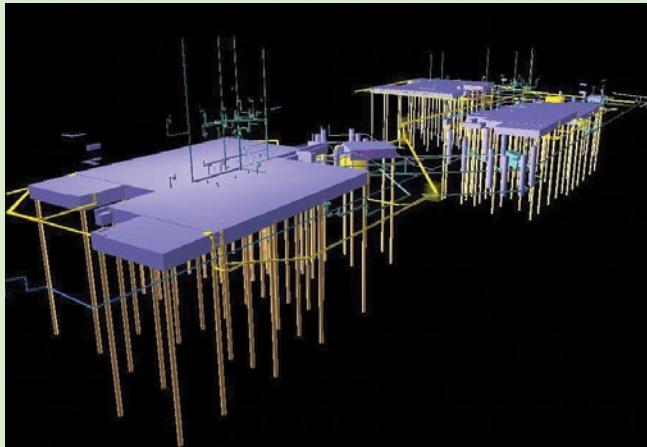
Jellicoe Street Structural Model Piers to Slabs
